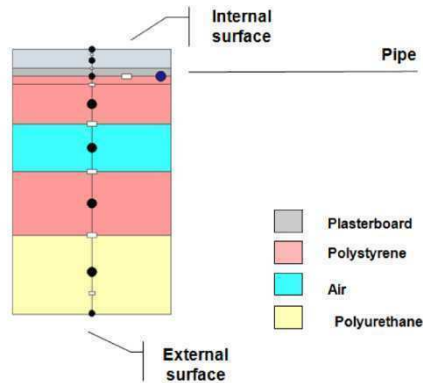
7 Discretization of the wall West construction (see also Table 4.4))
